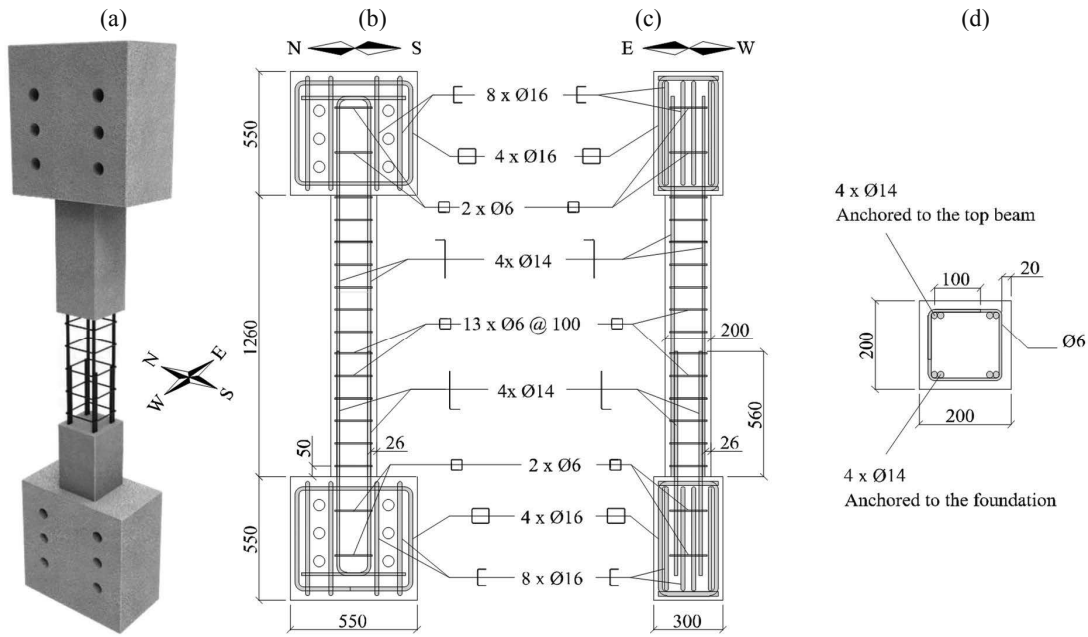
Main geometrical and reinforcement features of specimen LAP-P1: (a) 3D representation; (b) and (c) Vertical sections along E-W and N-S directions; (d) Cross-section.
